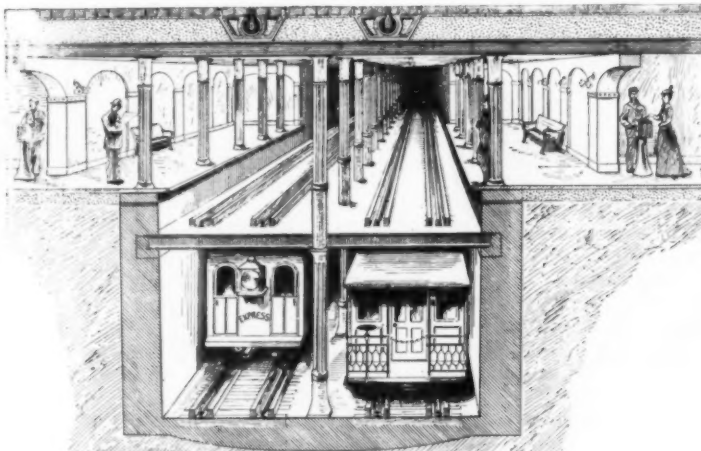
THE RENO TUNNEL, SHOWING ARRANGEMENT OF STATIONS BENEATH CROSS STREETS.
